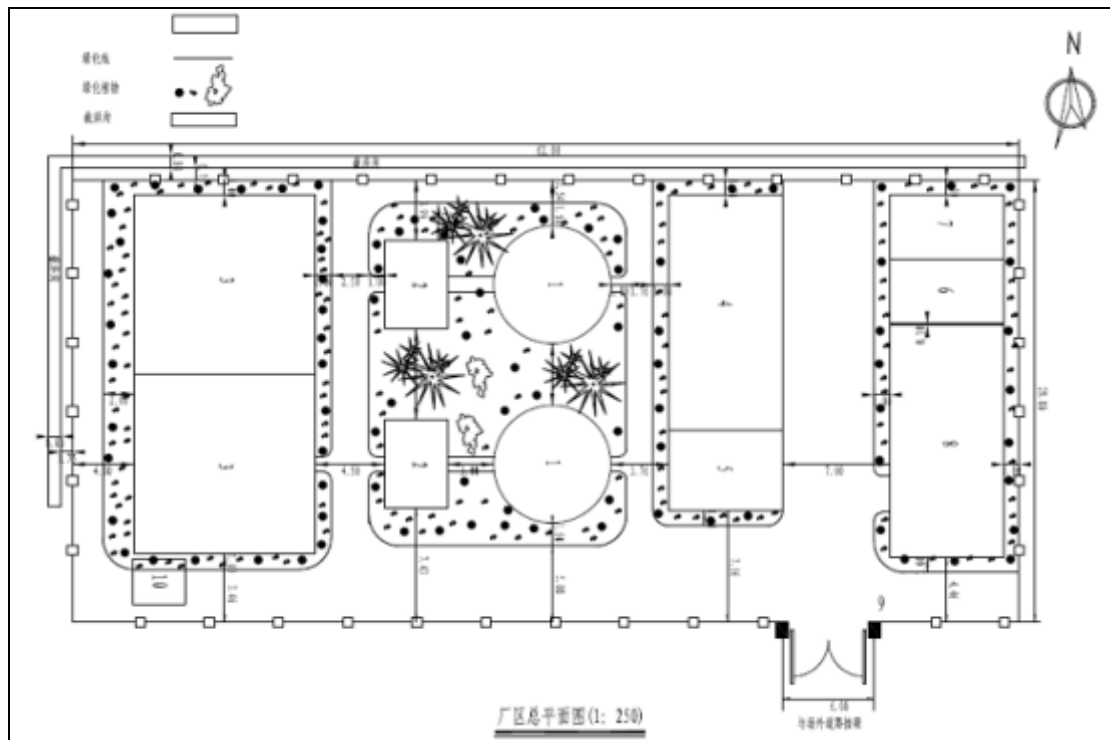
Plant Area Arrangement Plan of Water Plant of Lanju Town, Longquan City
